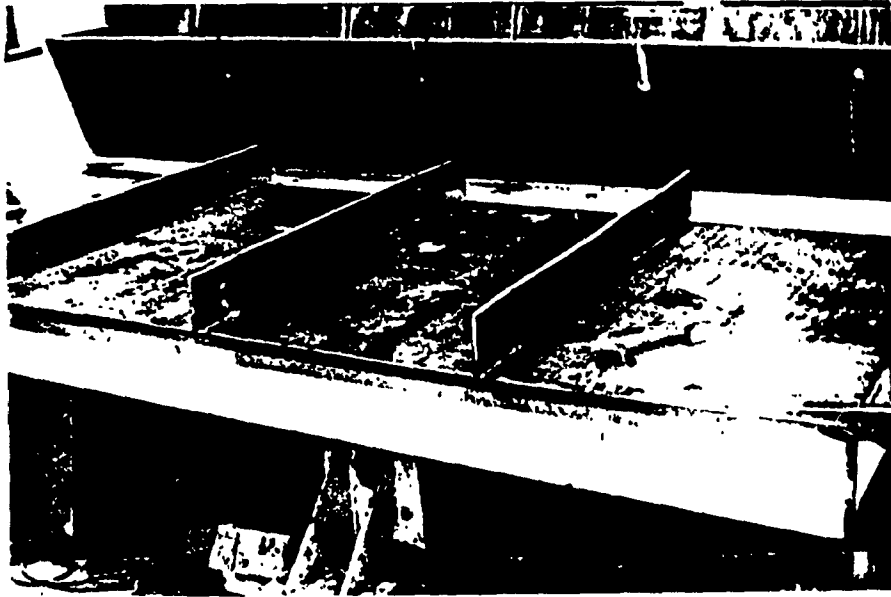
The transverse steel ribs are welded to the top flange.
